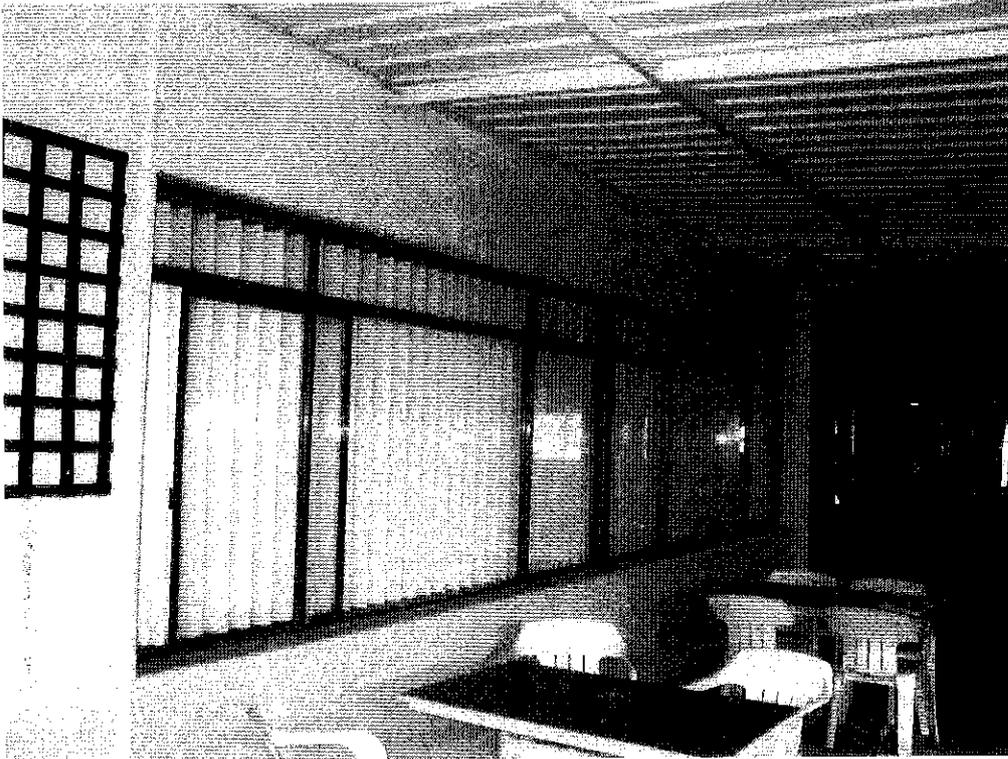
Recent sliding window from dining room to beer garden. Hocking Planning & Architecture (WDW). February 2003.
